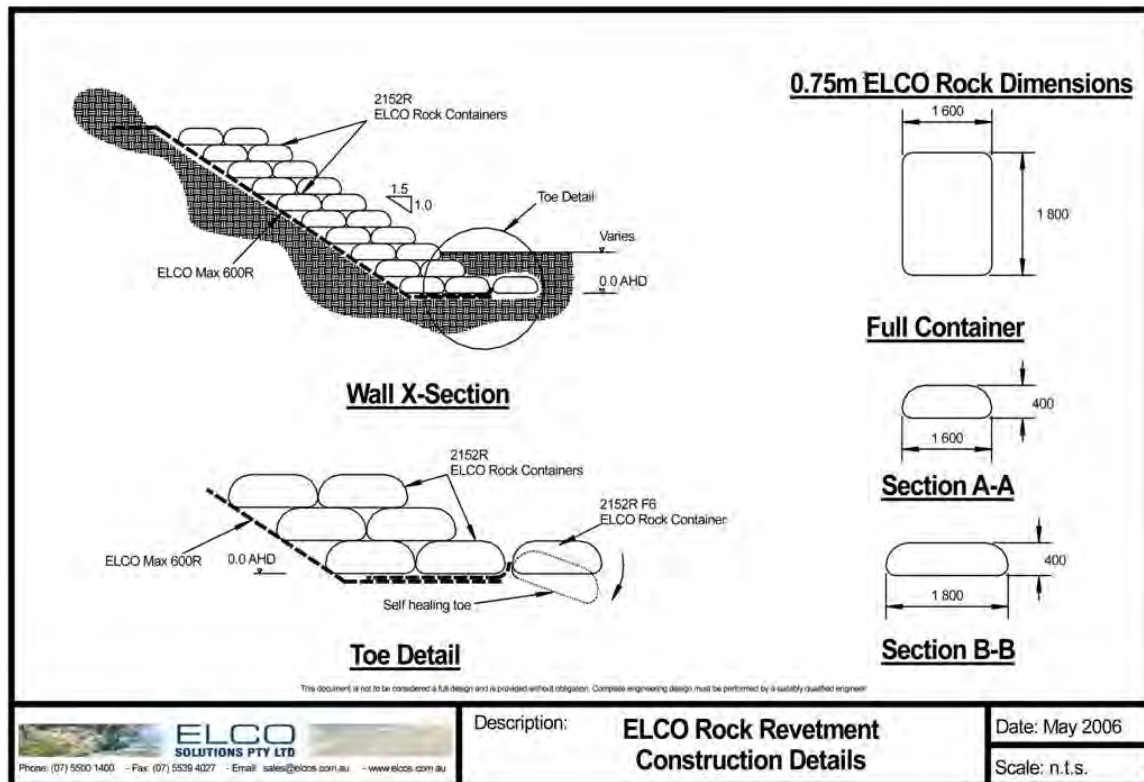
ELCORock dimensions for 0.75 m³ bag and revetment cross section (source: ELCORock Solutions)
